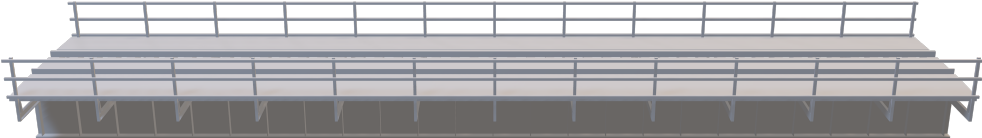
Bridge B2 – plate girder bridge without bridge deck.
